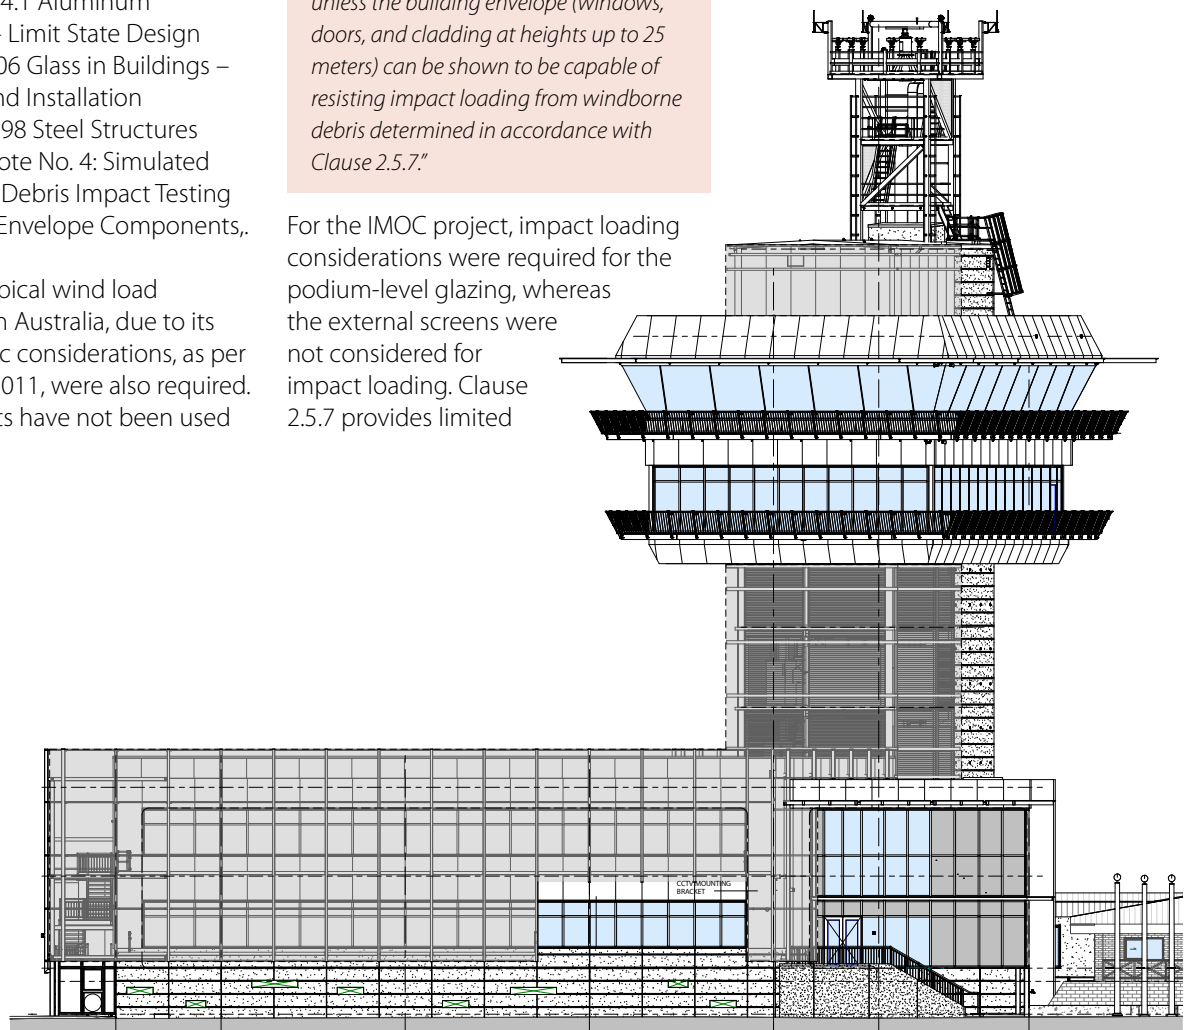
IMOC – southwest elevation. © Pindan / JML-Craft
